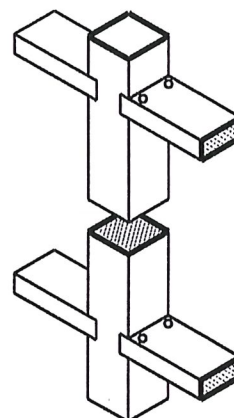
Exterior Connection: Top/Bottom Rail Skew Nailed to Post - 76 mm (3") NailsNotes:
